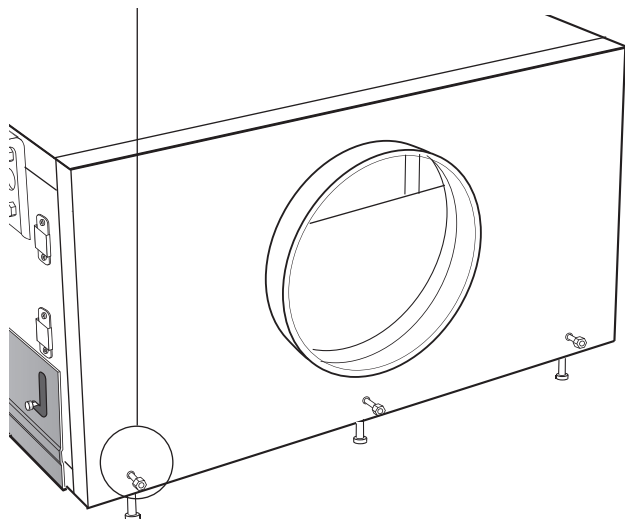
Step 3: Lower the extrusion containing the access panel (on each side of the unit) so the 3 extrusion fixings move to the top of the 3 "L" cut-out shapes in the sides of the extrusions as shown in Fig 14d (B). When completed the extrusions/access panel will drop down by the depth of the "L" cut-out shapes enabling the access panel to be slid open, see Fig 15a.
